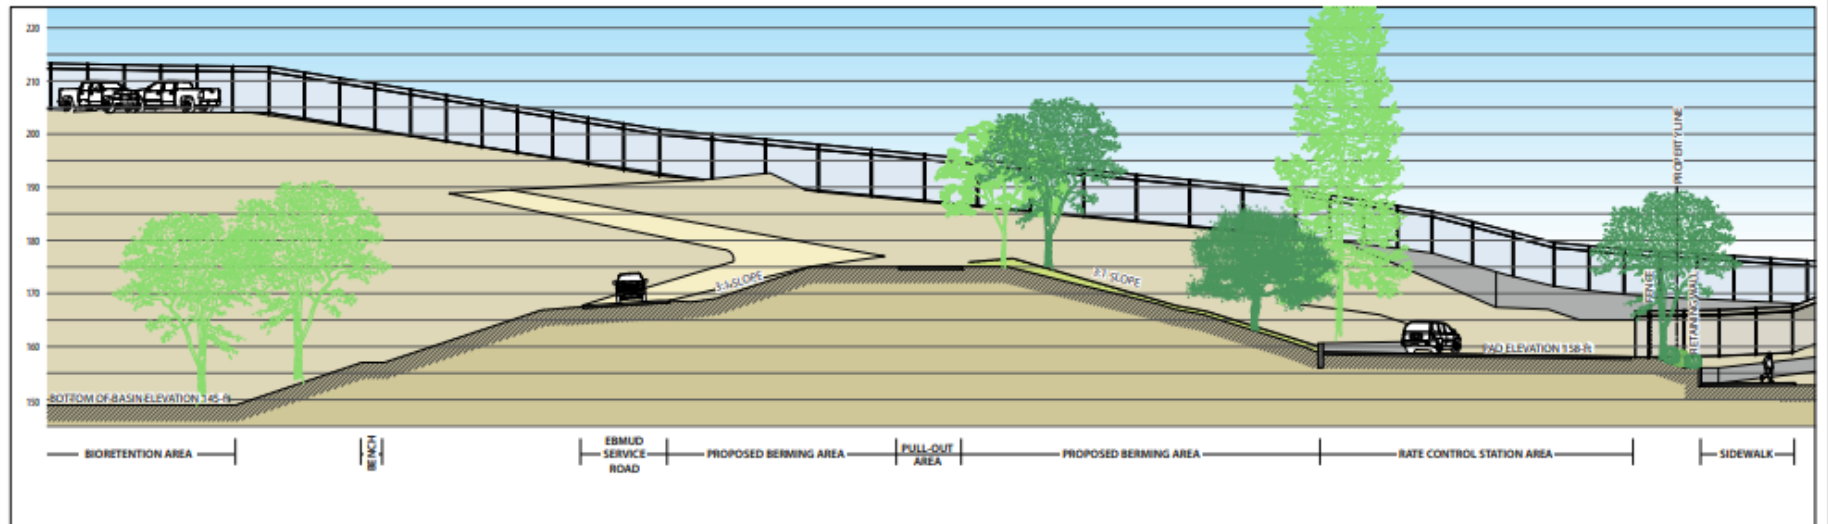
Cross-Sections of Site Plan at Ardley Avenue
